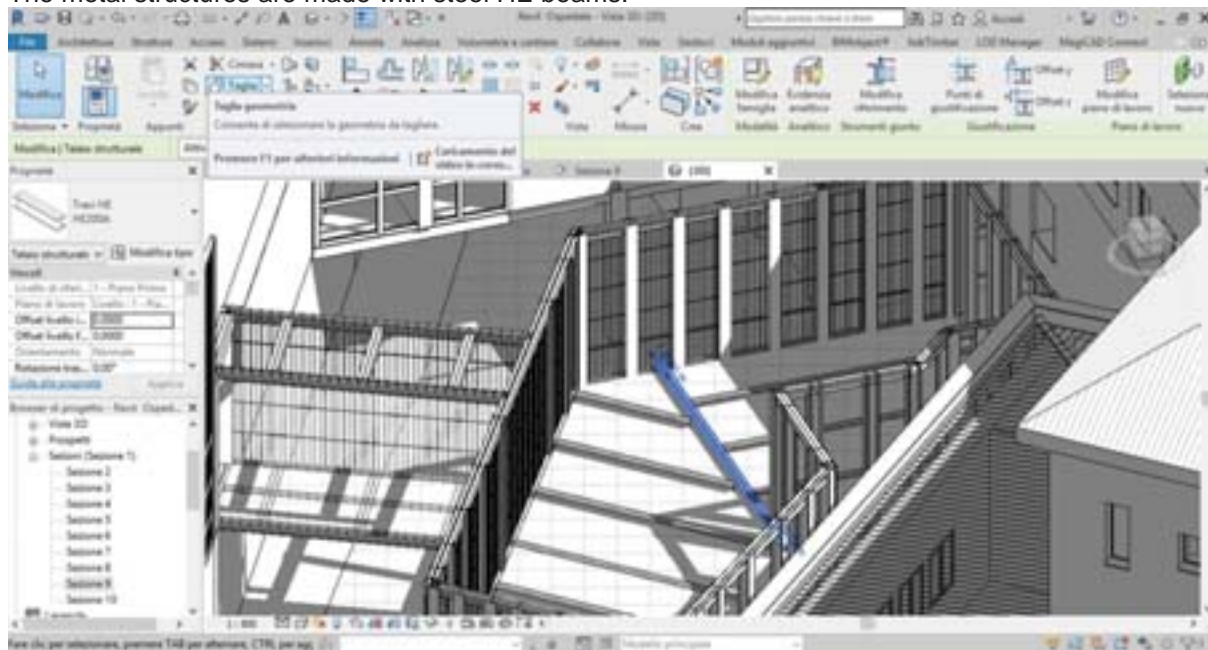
Detail of the HE200a beam for horizontal connection of the metal elements
